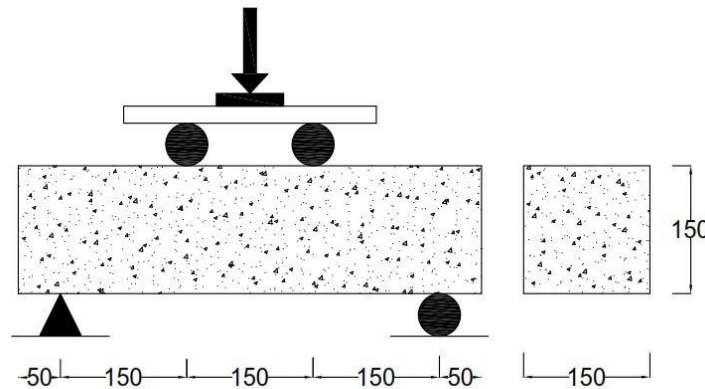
Specimen of the none-reinforced concrete beam (NRC-B)
